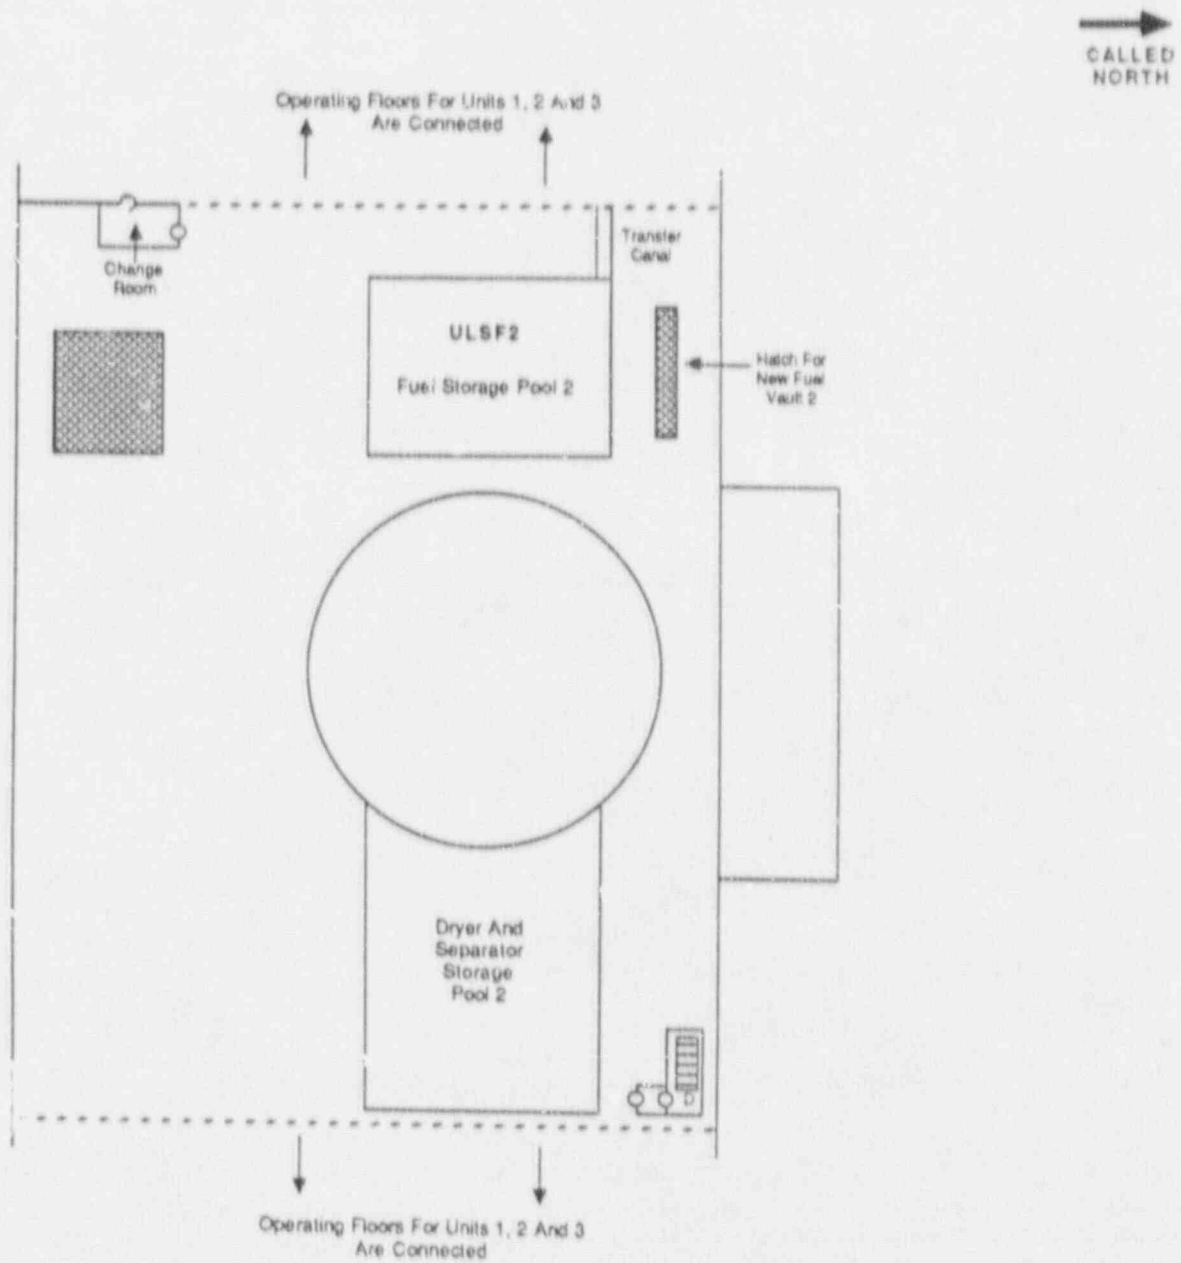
Browns Ferry Unit 2 Reactor Building - 664 ft. Elevation.
